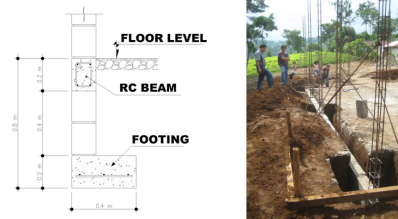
Foundation system. a) Elevation view, b) General view [8].
